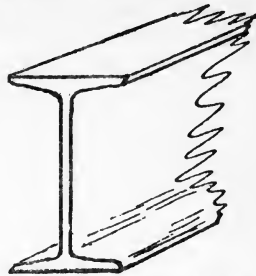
The simplest type of steel beams or girders. These are just a solid piece of steel, rolled as described in Chapter VI. They are much used in the framework of buildings. They are generally called rolled steel joists.
